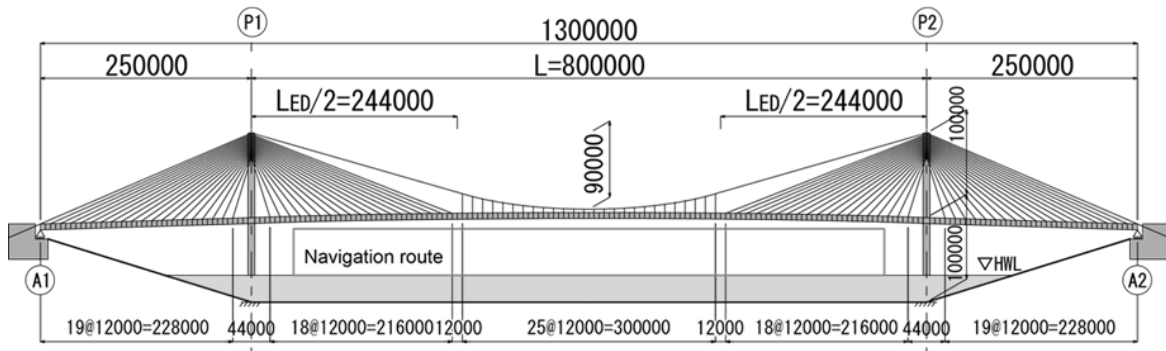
Hybrid of Extradosed and Suspension Bridge with 800m Span
